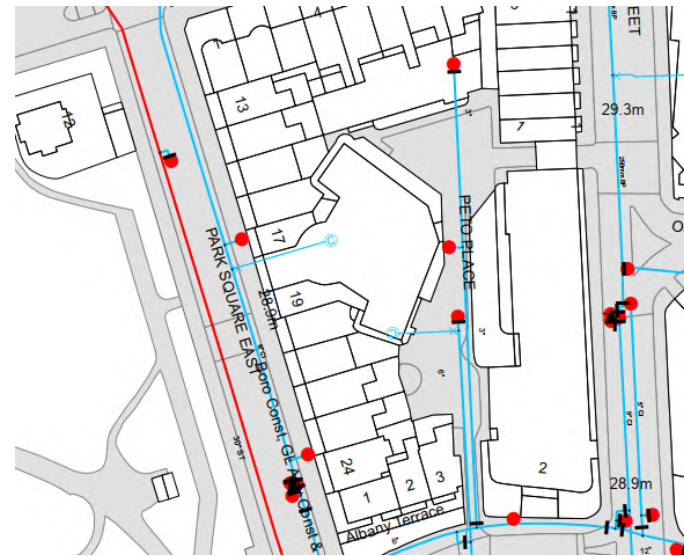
Thames Water Mains Water Route Relevant to Site Location
